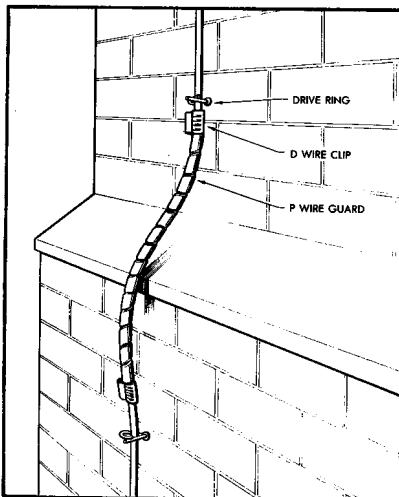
Drop Wire Crossing Masonry Building Projection
